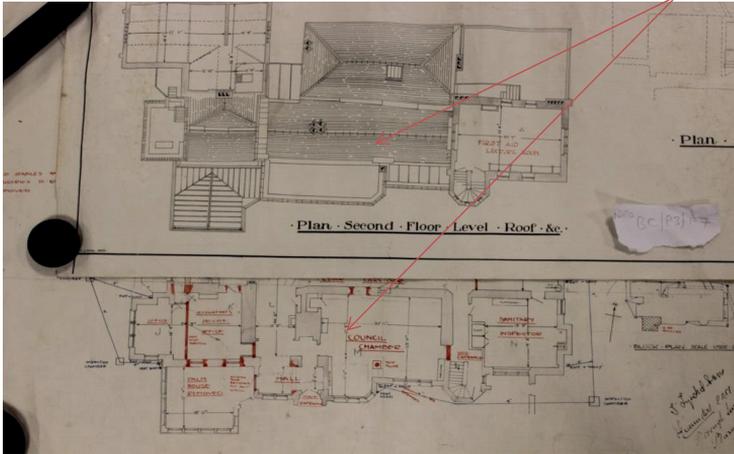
(above): 1927 Plans, Castle House, Barnstaple, roof and ground floor (from NDRO, BC/P3/1-7, reproduced with consent of North Devon Council).
